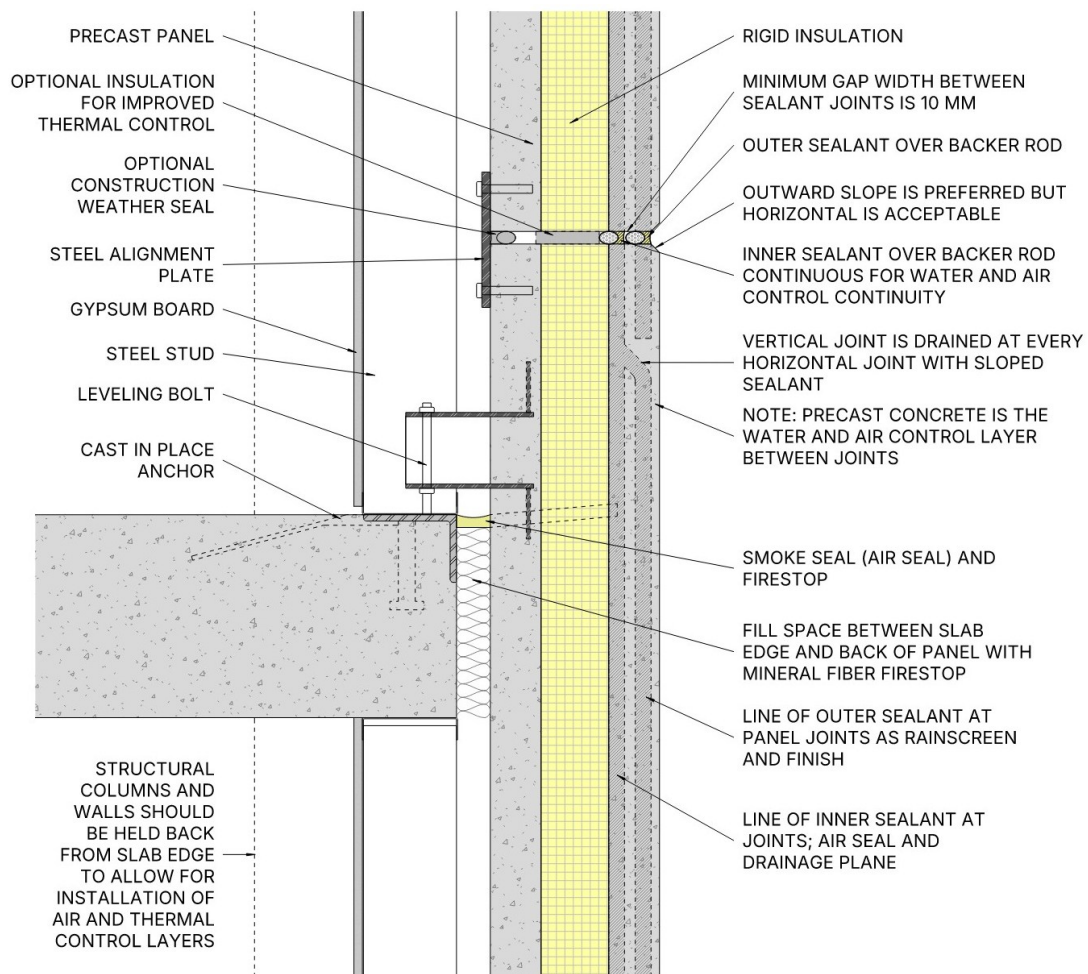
Section of a high-performance double-wythe insulated precast concrete panel at the floor level.
